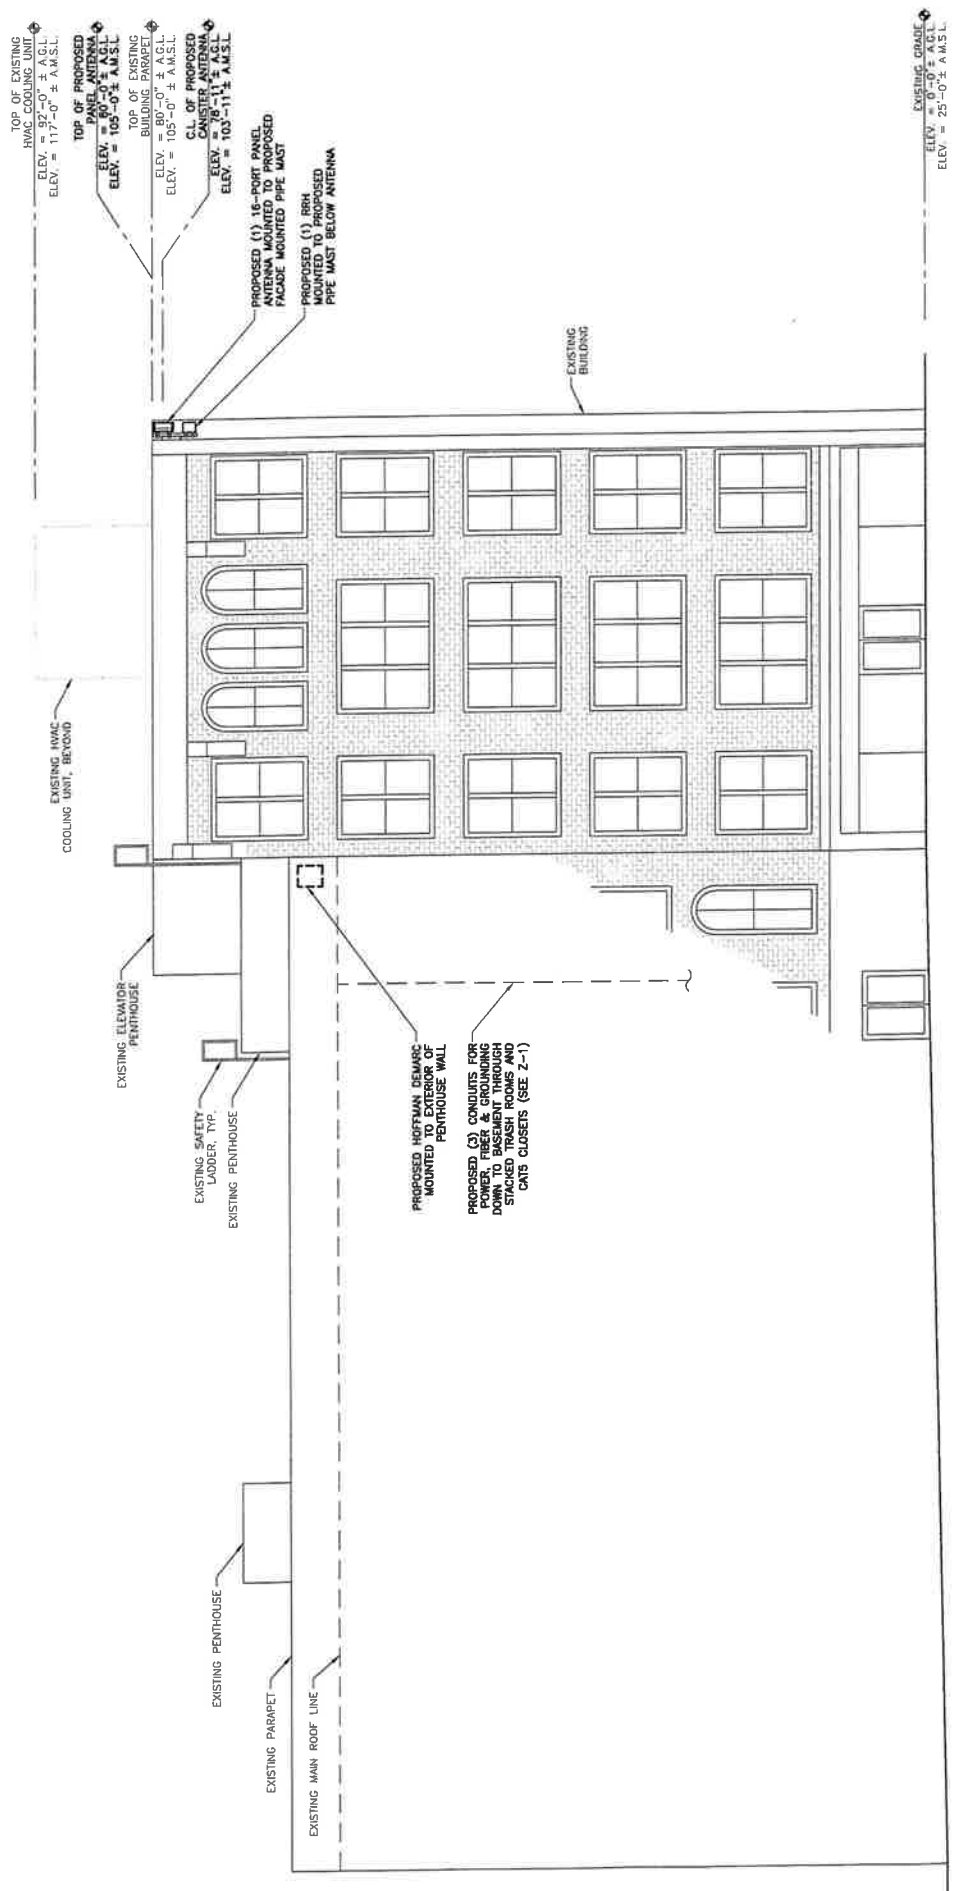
PROPOSED EQUIPMENT ELEVATION PLAN
